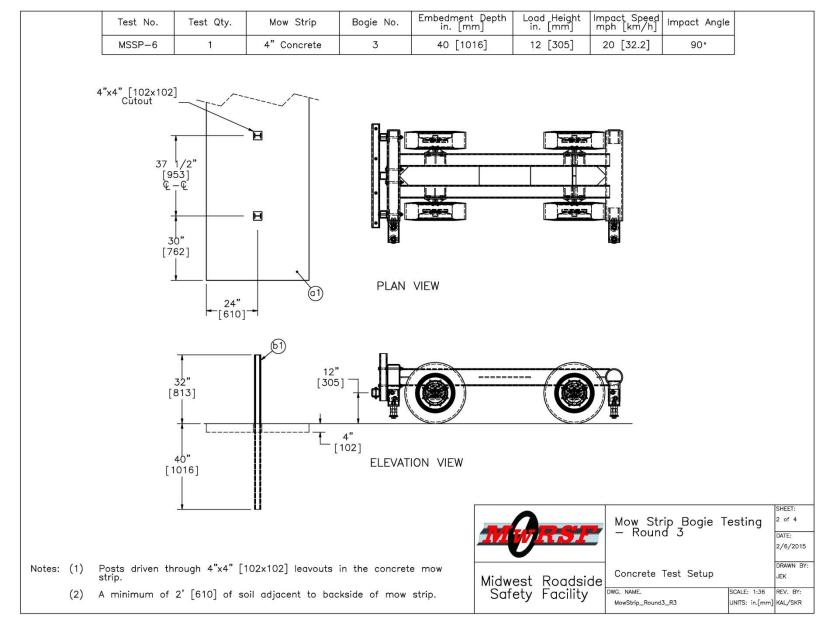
Test Setup and Concrete Mow Strip Configuration, Component Testing Round 3
